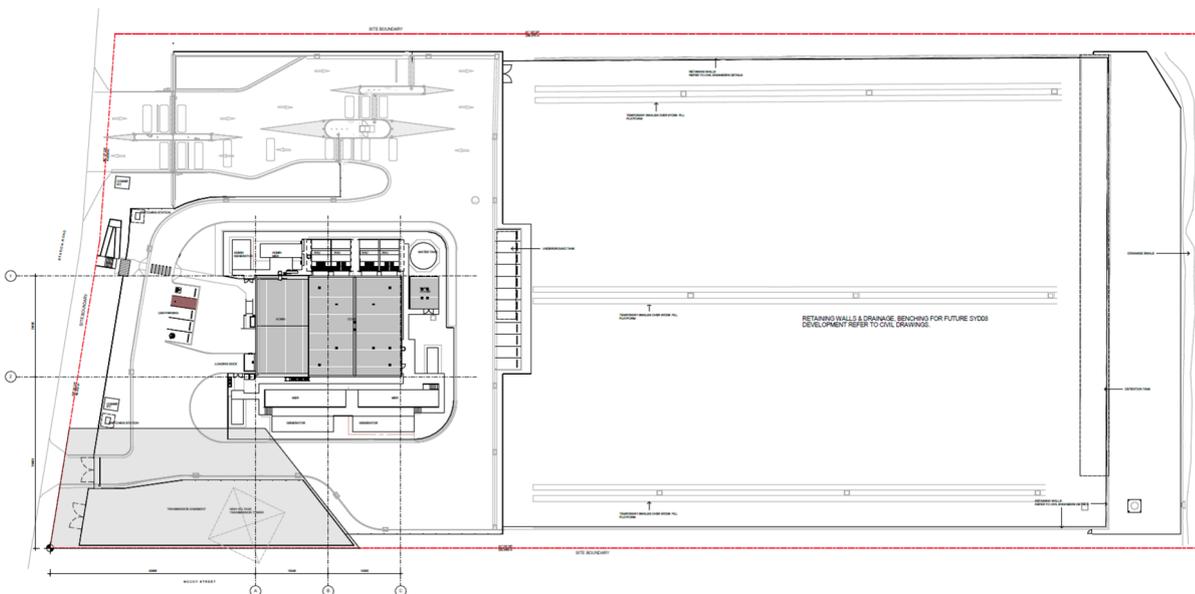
Site Plan for approved data centre (SYD09) on Site, under DA-21-01058.
